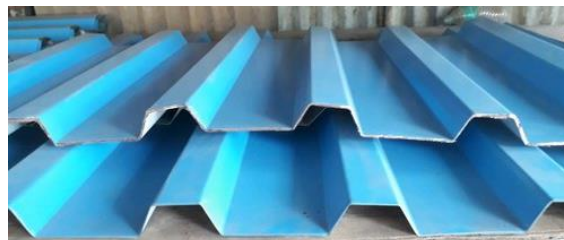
Steel profile roof panel (Dehli F.N. Steel, 2020)
